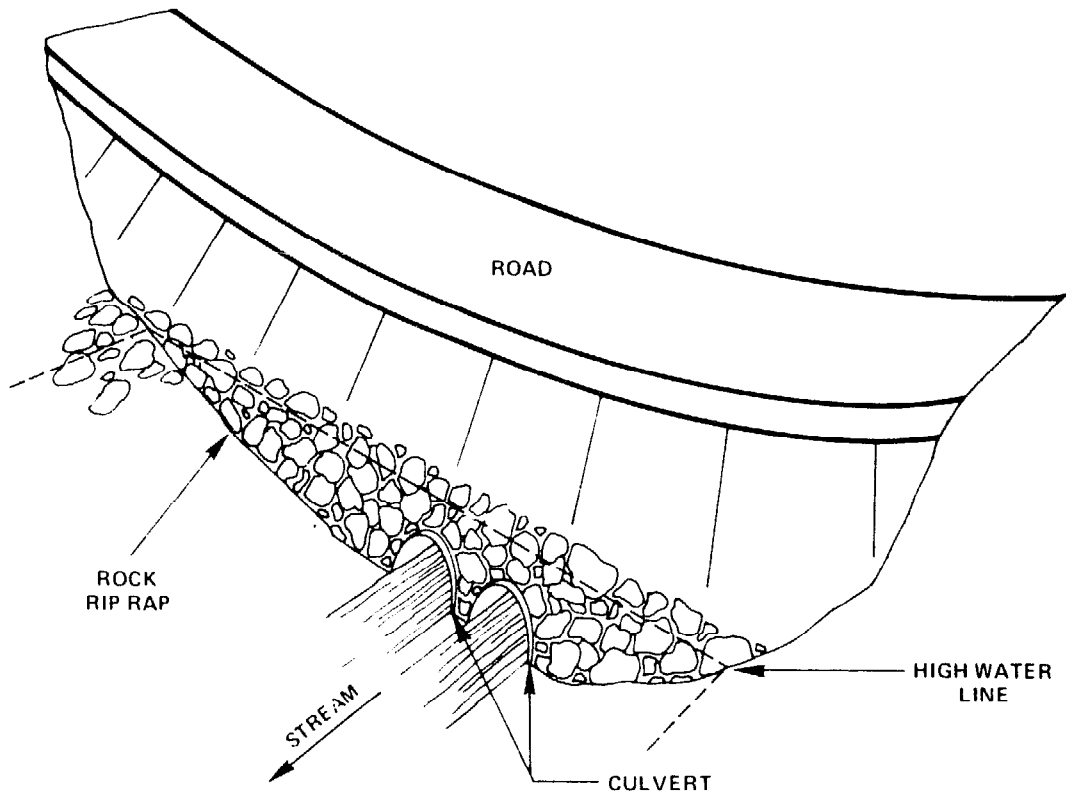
Rock rip-rap protection for embankment at a culvert installation.
